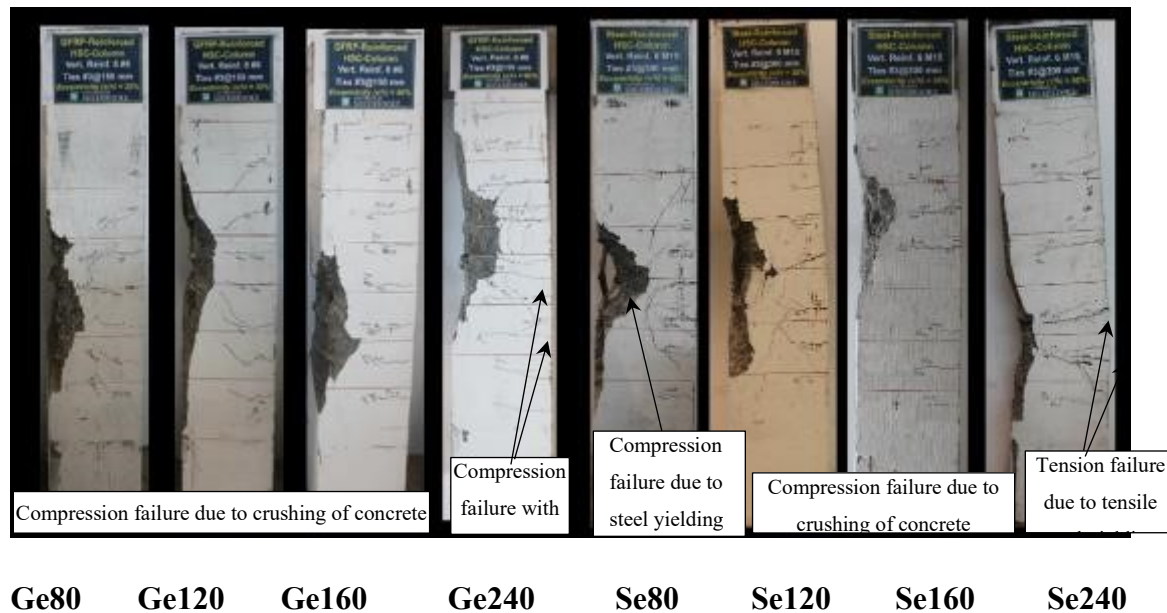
Side view for the failure mode for group GFRP and steel reinforced columns series.
